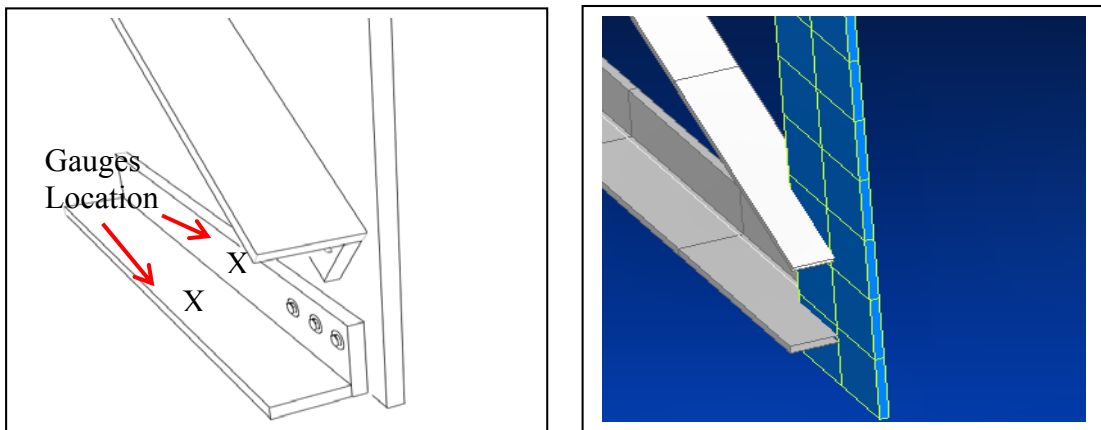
Cross-frame Connection Detailing, Field (left) and Rendered View of Original FEM (right)
